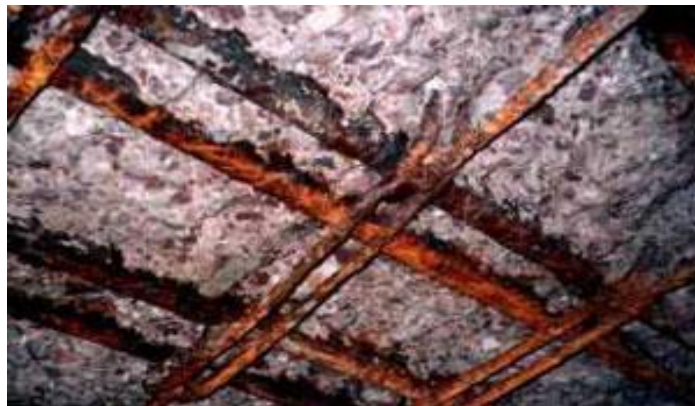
Corrosion in Reinforced concrete structures
